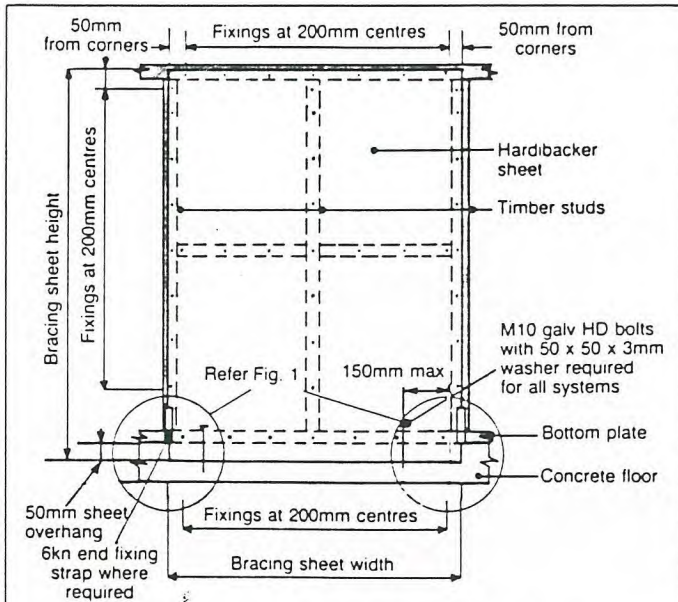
Hardibacker to Concrete Slab with and without Straps
